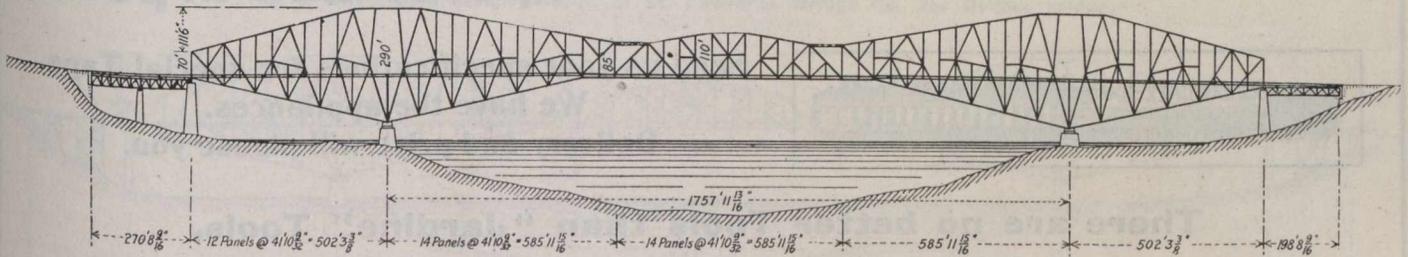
Official design V, by Board of Engineers, for new bridge.
